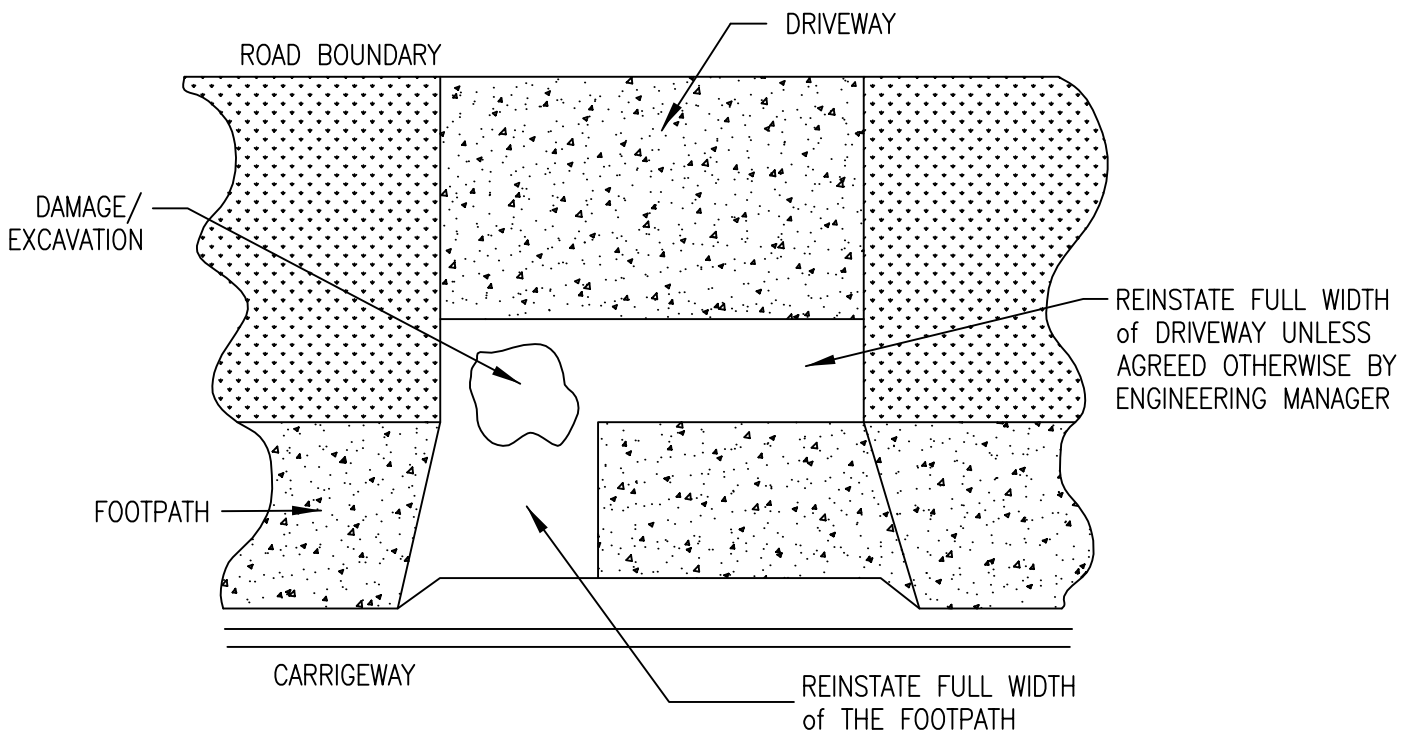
EXCAVATION IN FOOTPATH OR DRIVEWAY
